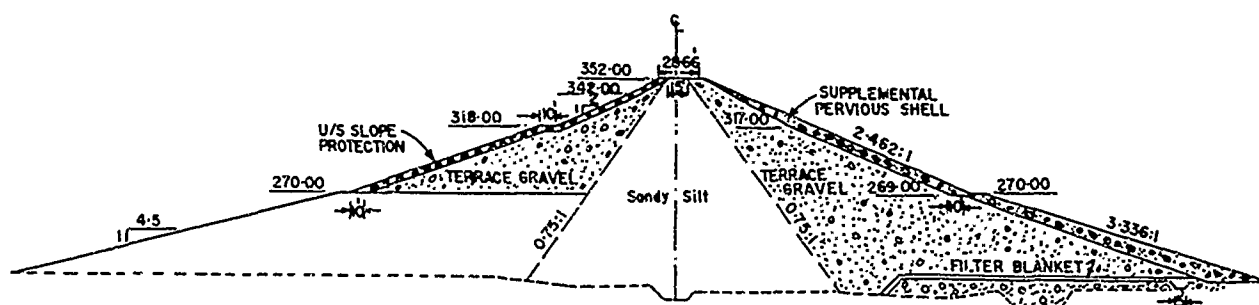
HUB DAM - TYPICAL ZONED SECTION
